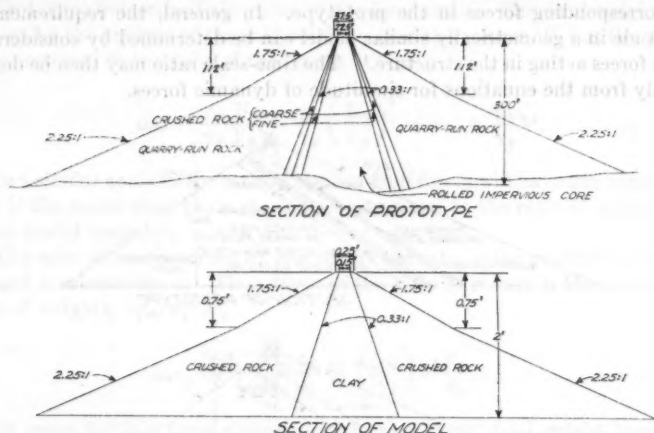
SECTION VIEWS OF SLOPING-CORE ROCK-FILL DAM
